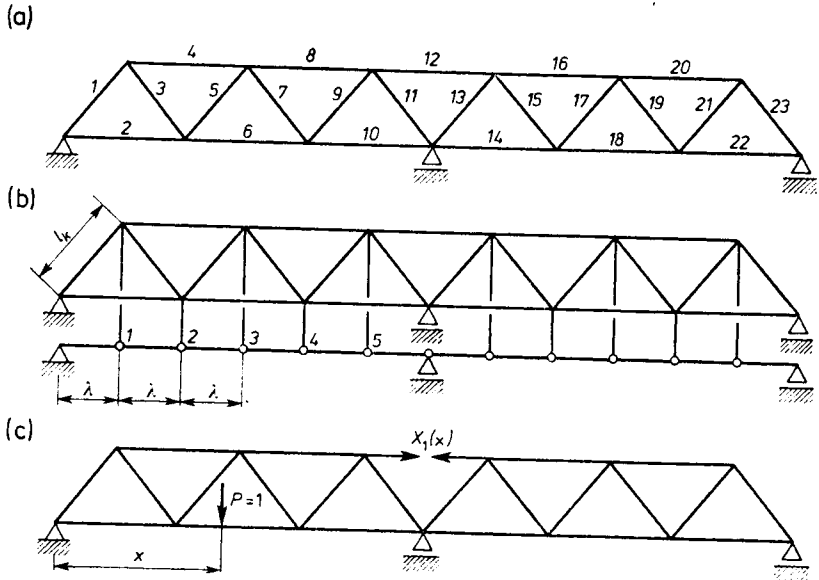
Two-span truss: (a) considered structure; (b) truss with weight less platform; (c) primary system
